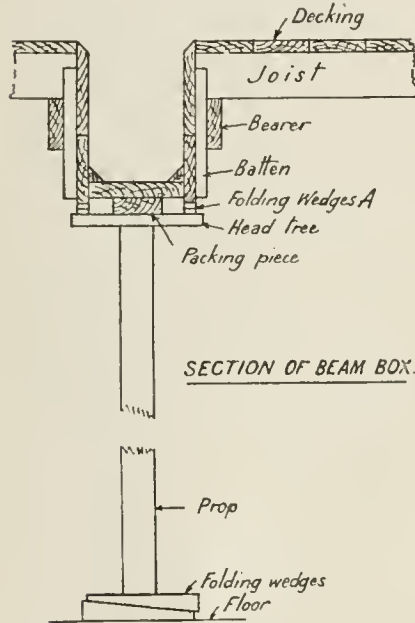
Section of beam box, with bearers, etc., for floor decking. The above arrangement permits the beam-sides to be removed without disturbing the soffit or the props under the beam. By removing the wedges at A the beam-sides and decking may be struck after about fourteen days, leaving the soffit and props, which should be undisturbed for at least six weeks. The battens are nailed to the beam-sides (with wire nails as described) and the bearers nailed to the battens. The joists and decking are not nailed. Screws dipped in oil could be used for this work, but, for many reasons, nails are found to be preferable.
